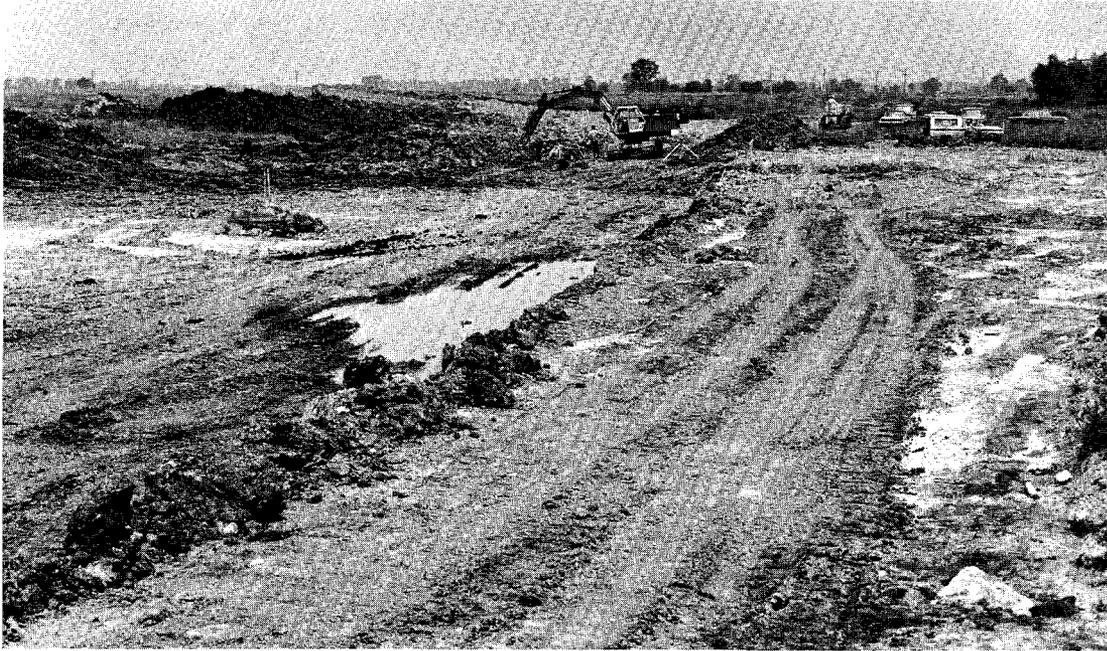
Excavation for the Proton Beam Line beyond the Master Substation.
